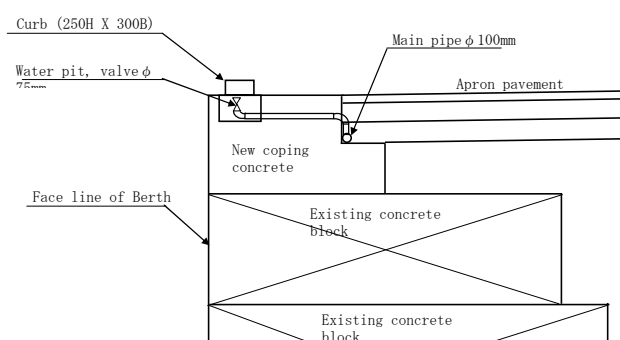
Improved Cap Structure of North Wharf
